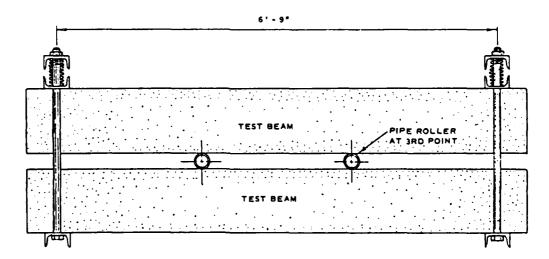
Method of loading tensile crack exposure beams of reinforced concrete
